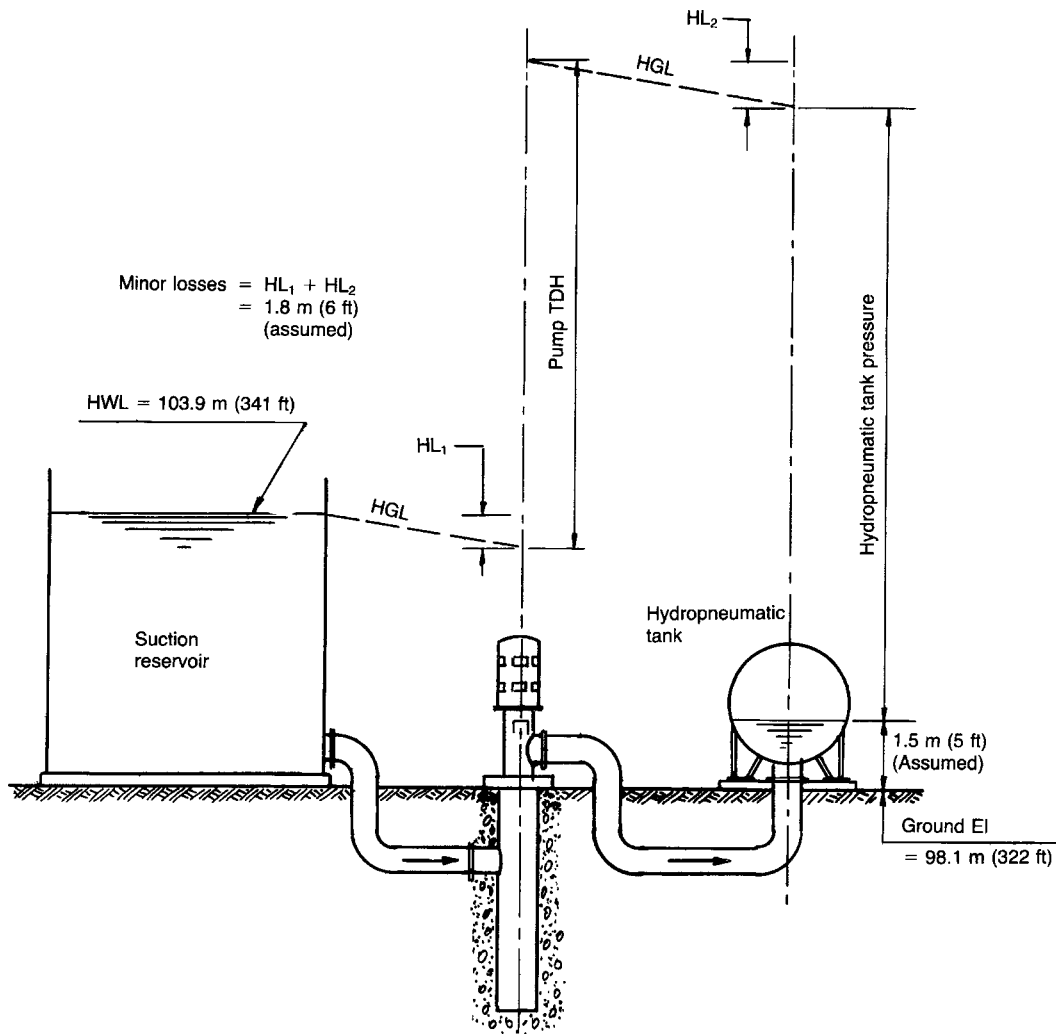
Booster pump hydraulic schematic. After Boyle Engineering Corp.
